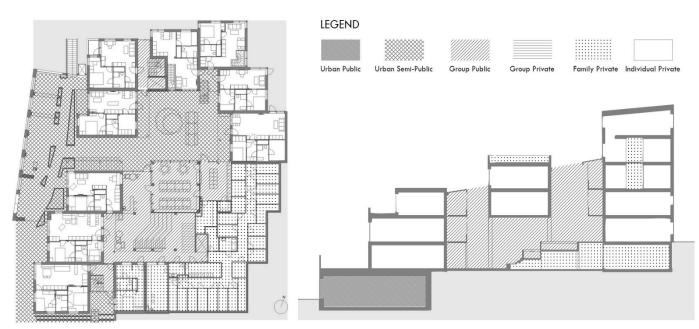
Spatial sharing in ground floor Plan (left) & Section (right)
